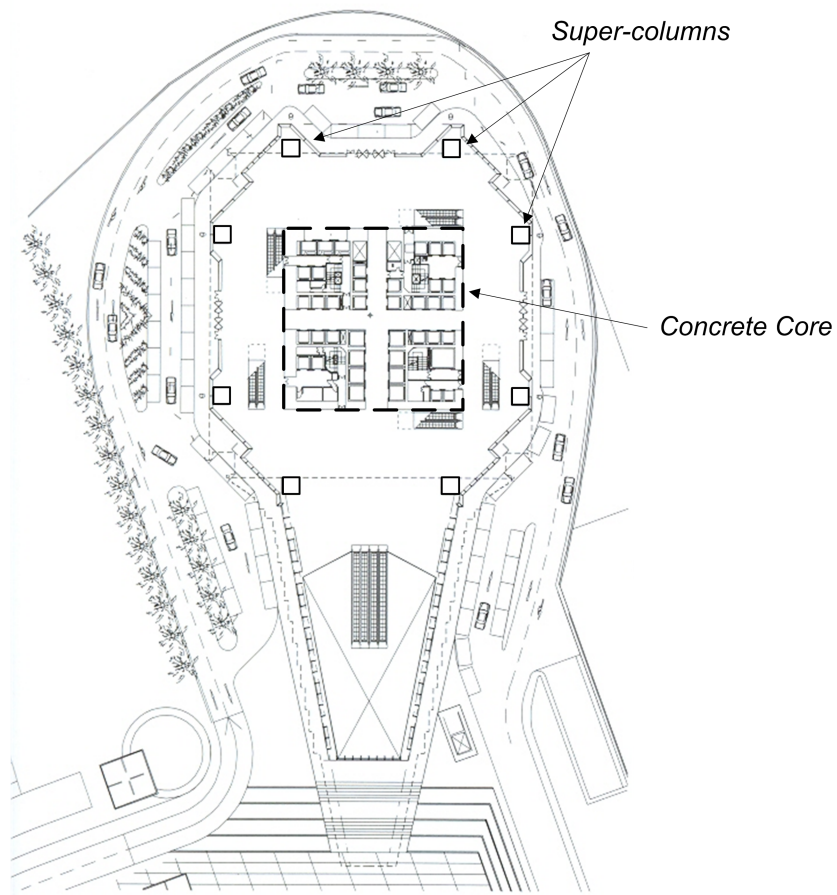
The floor plan of the ICC at ground level, with eight super-columns at the perimeter of the building
